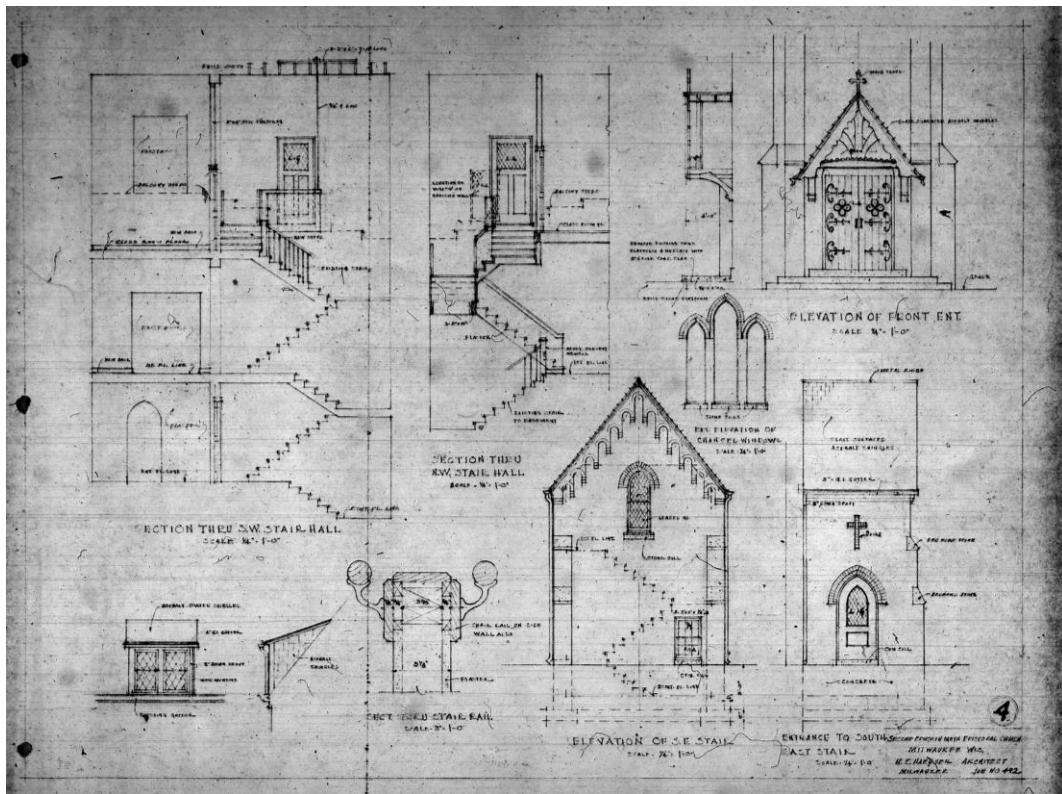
Multiple detail sections and elevations of the church by architect H.C. Haeuser, 1939.
